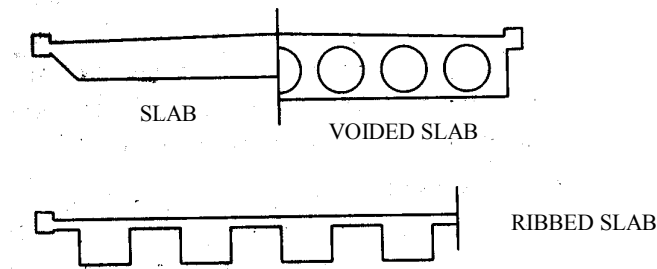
Sections of Voided (Hollowed) Slab and Ribbed Slab Bridge Decks
